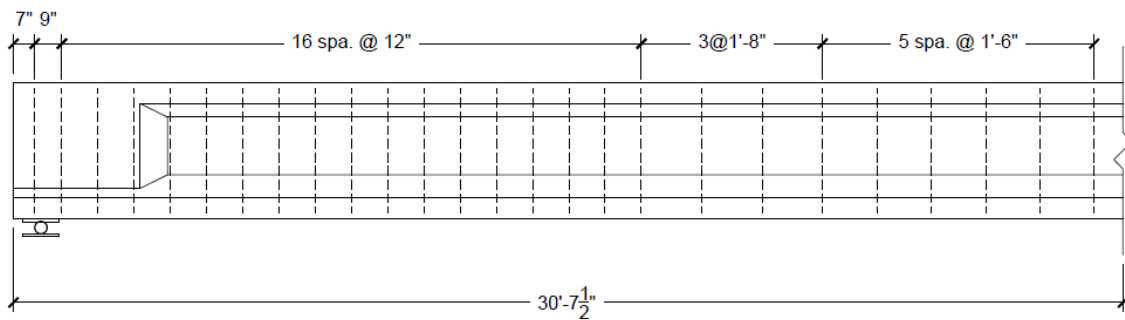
Bonner Bridge half-span elevation view stirrup layout (reproduced from original construction drawings).
